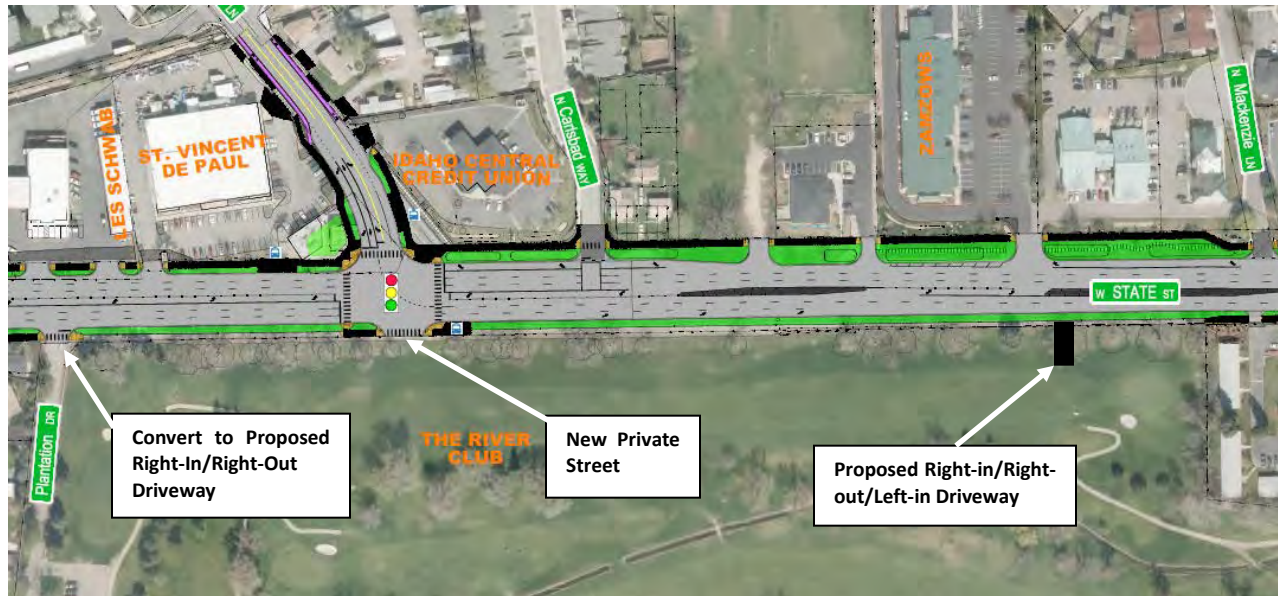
ACHD State Street / Pierce Park Concept Design with Proposed Site Accesses Noted
